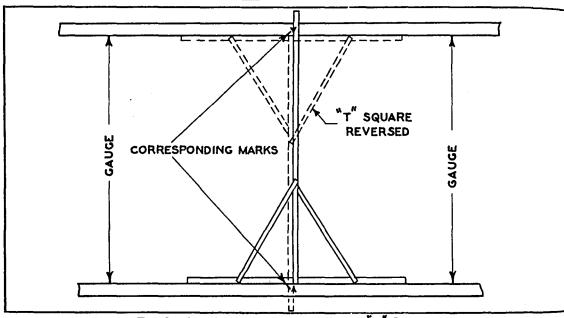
A METHOD OF CHECKING "T" SQUARES.
